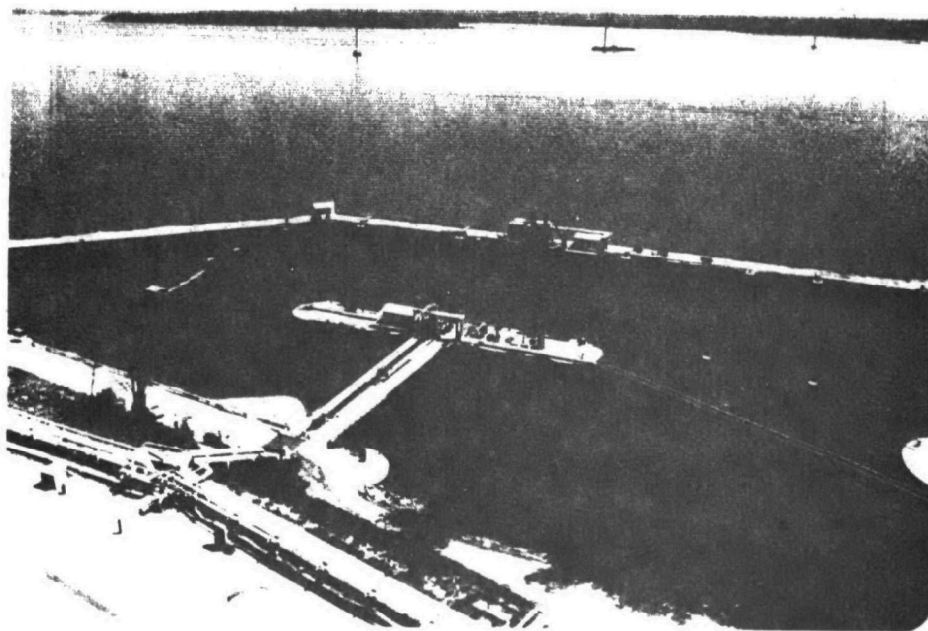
View from the roof of Boiler 5 facing north-east showing oil tanker unloading facilities on the Potomac.
